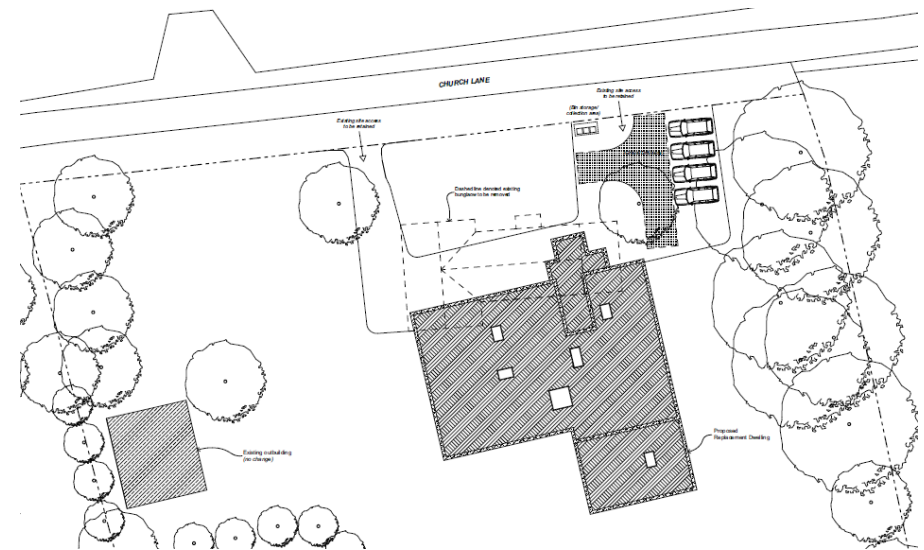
Proposed Site Layout (Dotted Line denotes the existing dwelling)
